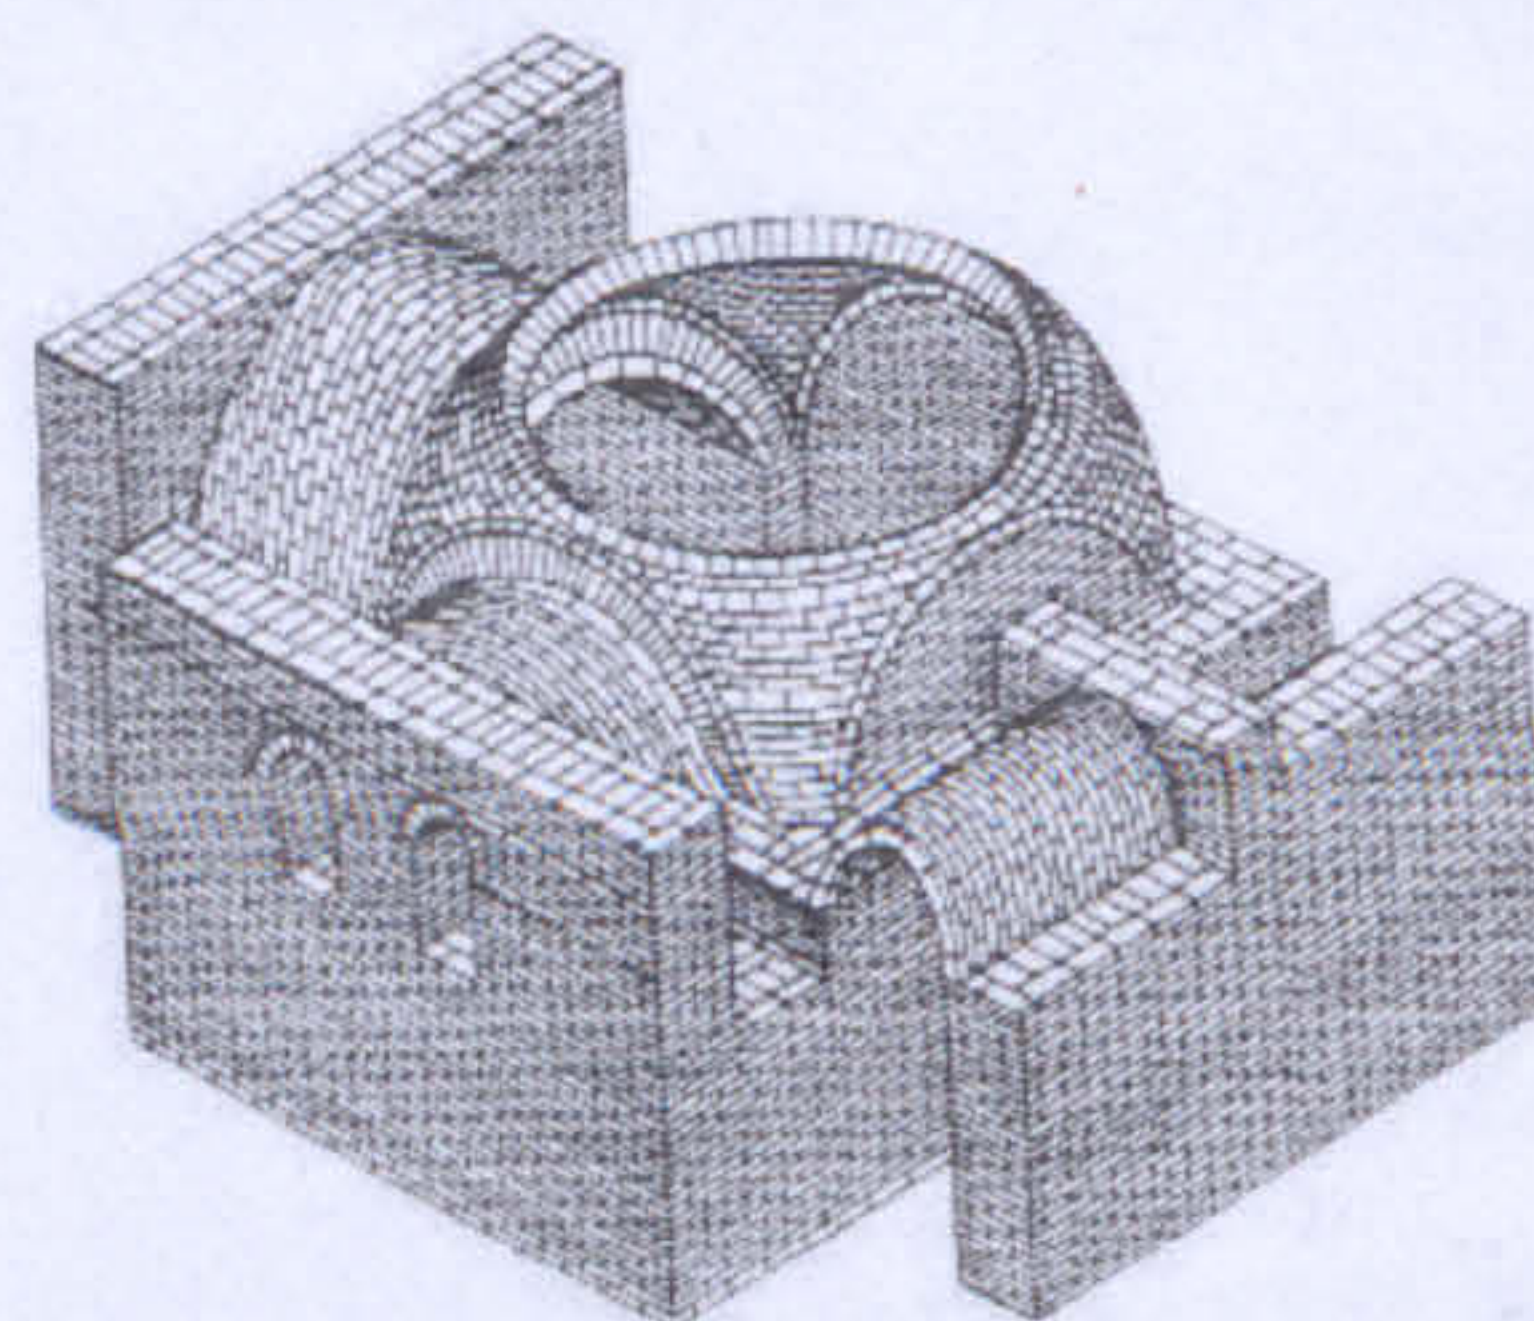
Typical mud brick construction of vault in a Nubian house, Source: Steele (1988 pp52)
